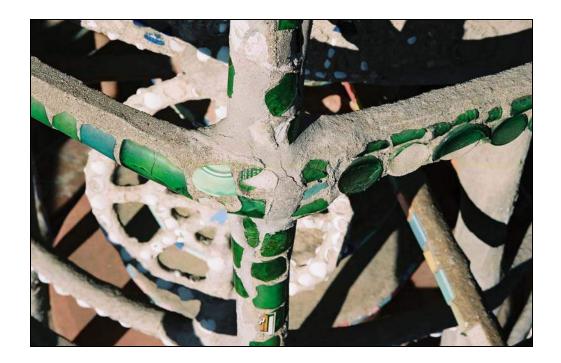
Crack on East Tower at intersection between of exterior column and exterior band.
